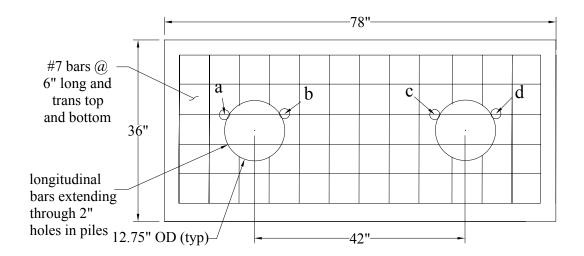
Pile-Cap and instrumentation plan view typical all caps.
